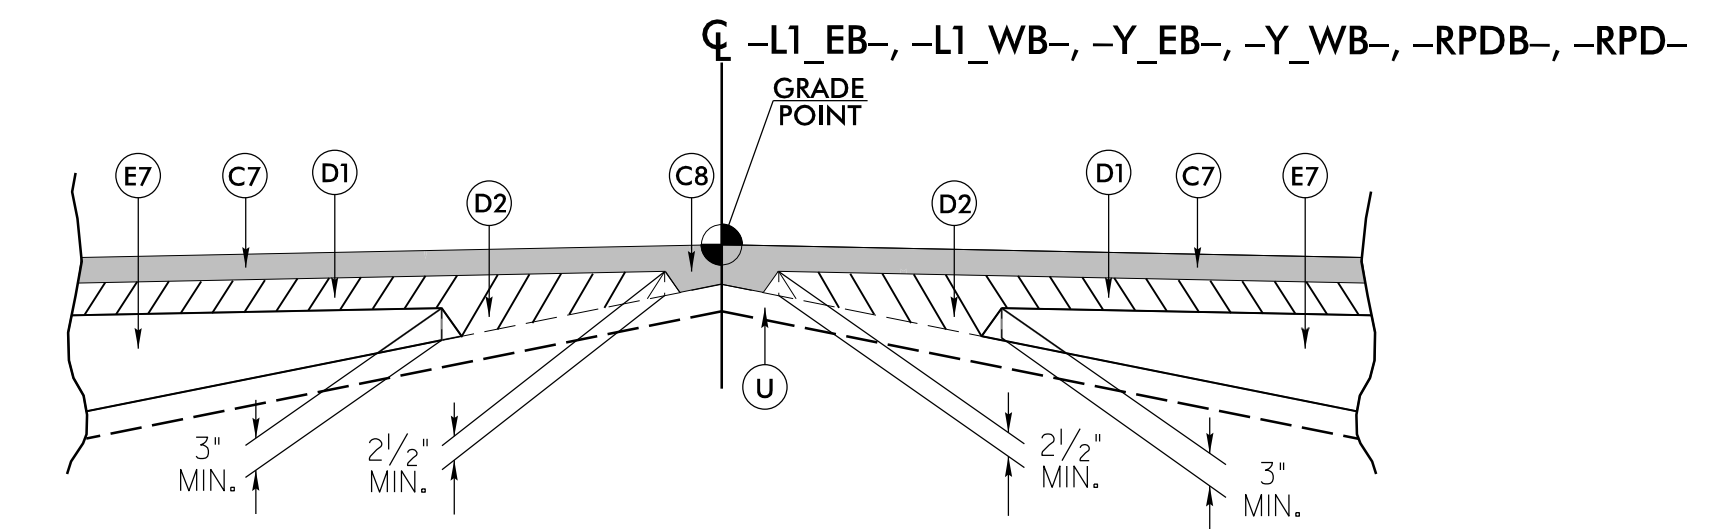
DETAIL SHOWING MILLED PAVEMENT TIE-IN
